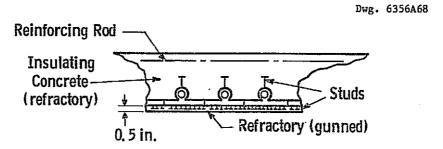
Ceramic lined flange tube wall of the diffuser
